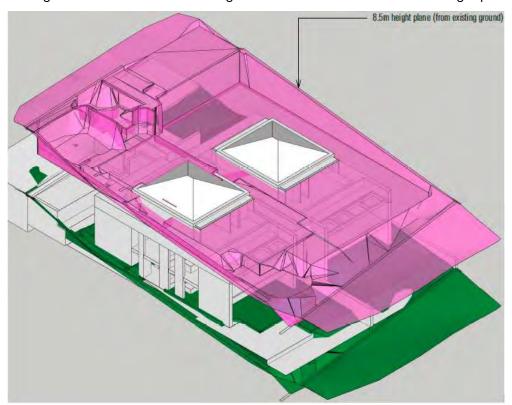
Subject site - Height Plane Overlay (Mathieson Architects)
